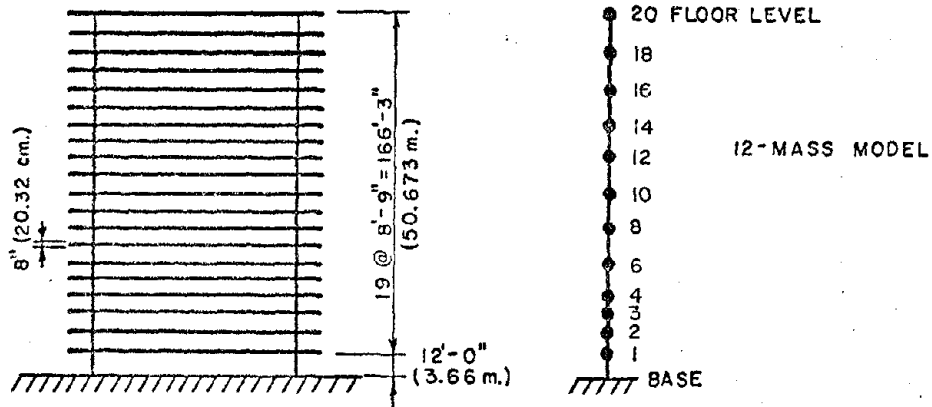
Twenty-Story Building with 'Isolated' Structural Walls
